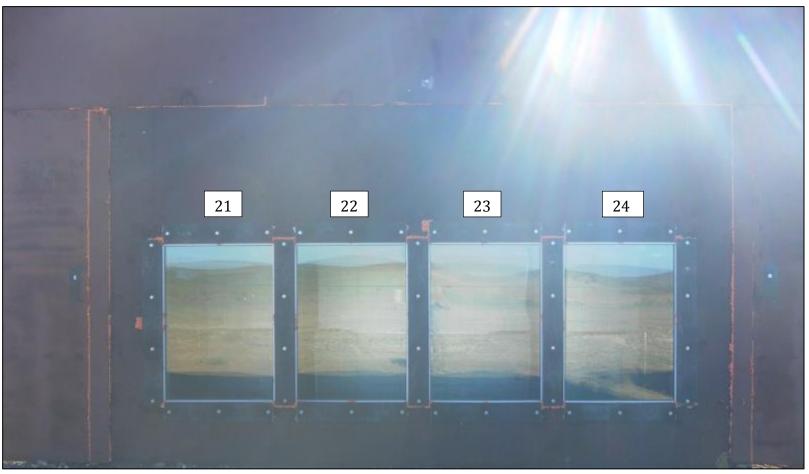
Test #3 Setup and Specimen Label – 7 psi Chamber
